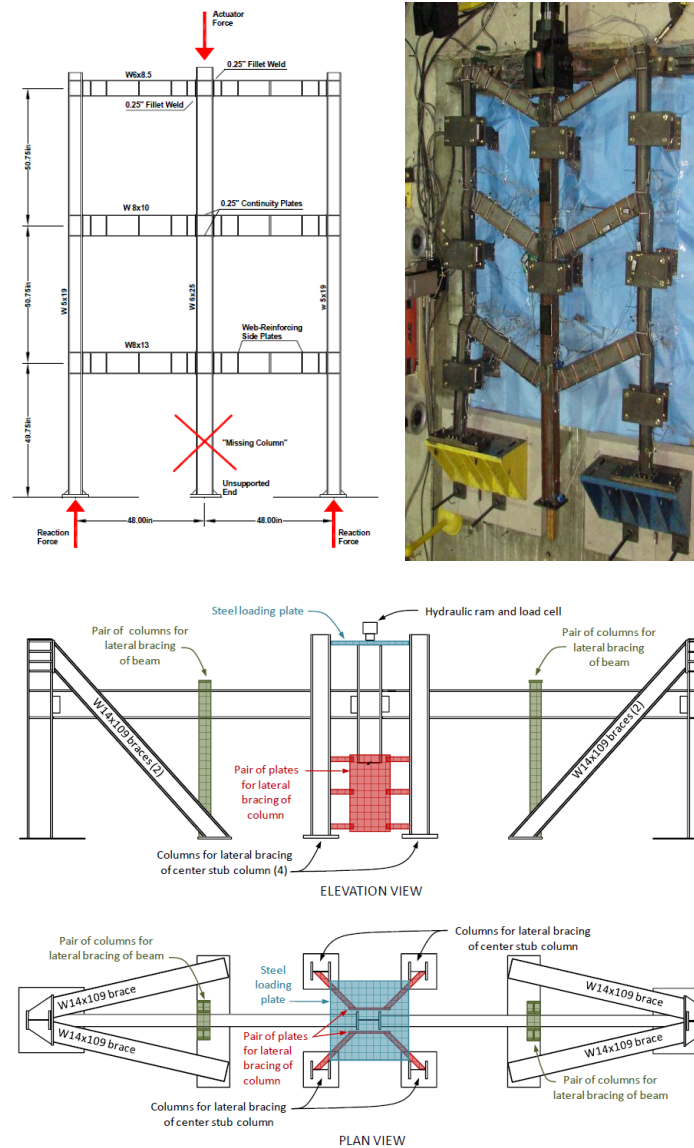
Tests in steel substructures with moment connections: (a) 2D frame (Tsitos 2009), (b) beam-column assembly (Sadek, *et al.* 2010)
